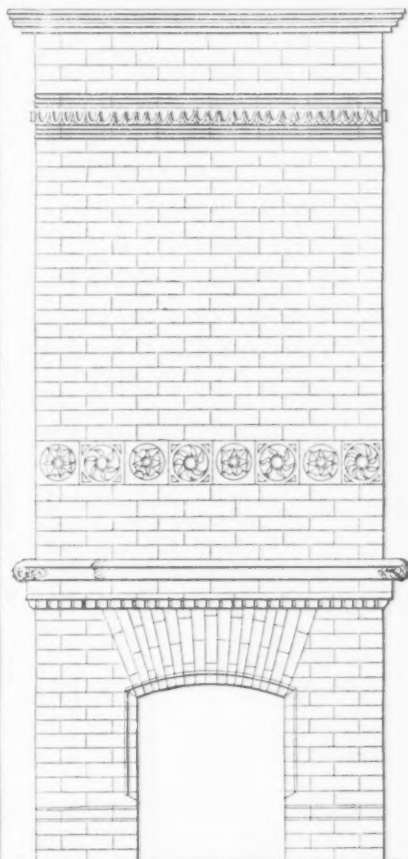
Office Chimney-Piece.—Scale,  $\frac{1}{4}$  Inch to the Foot.
